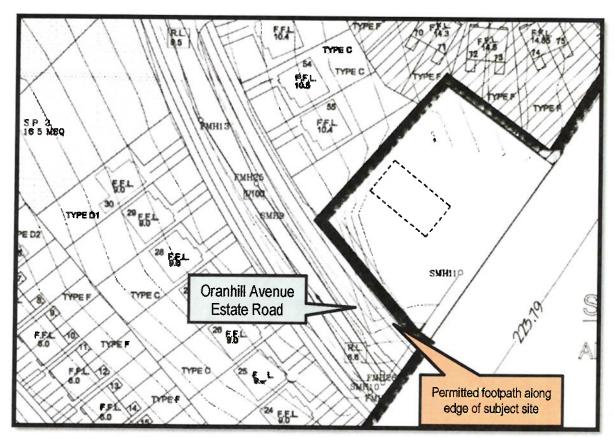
Extract from Pl. Ref. No. 04/2614 showing permitted layout for Oranhill Avenue estate
